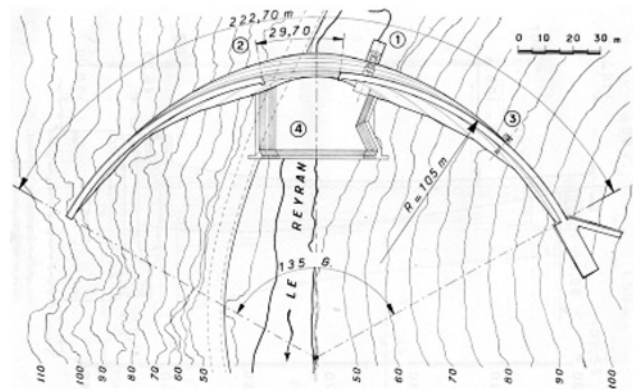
Layout of the arch dam; its right end abuts on a thrust block protected against water by a wing wall.
